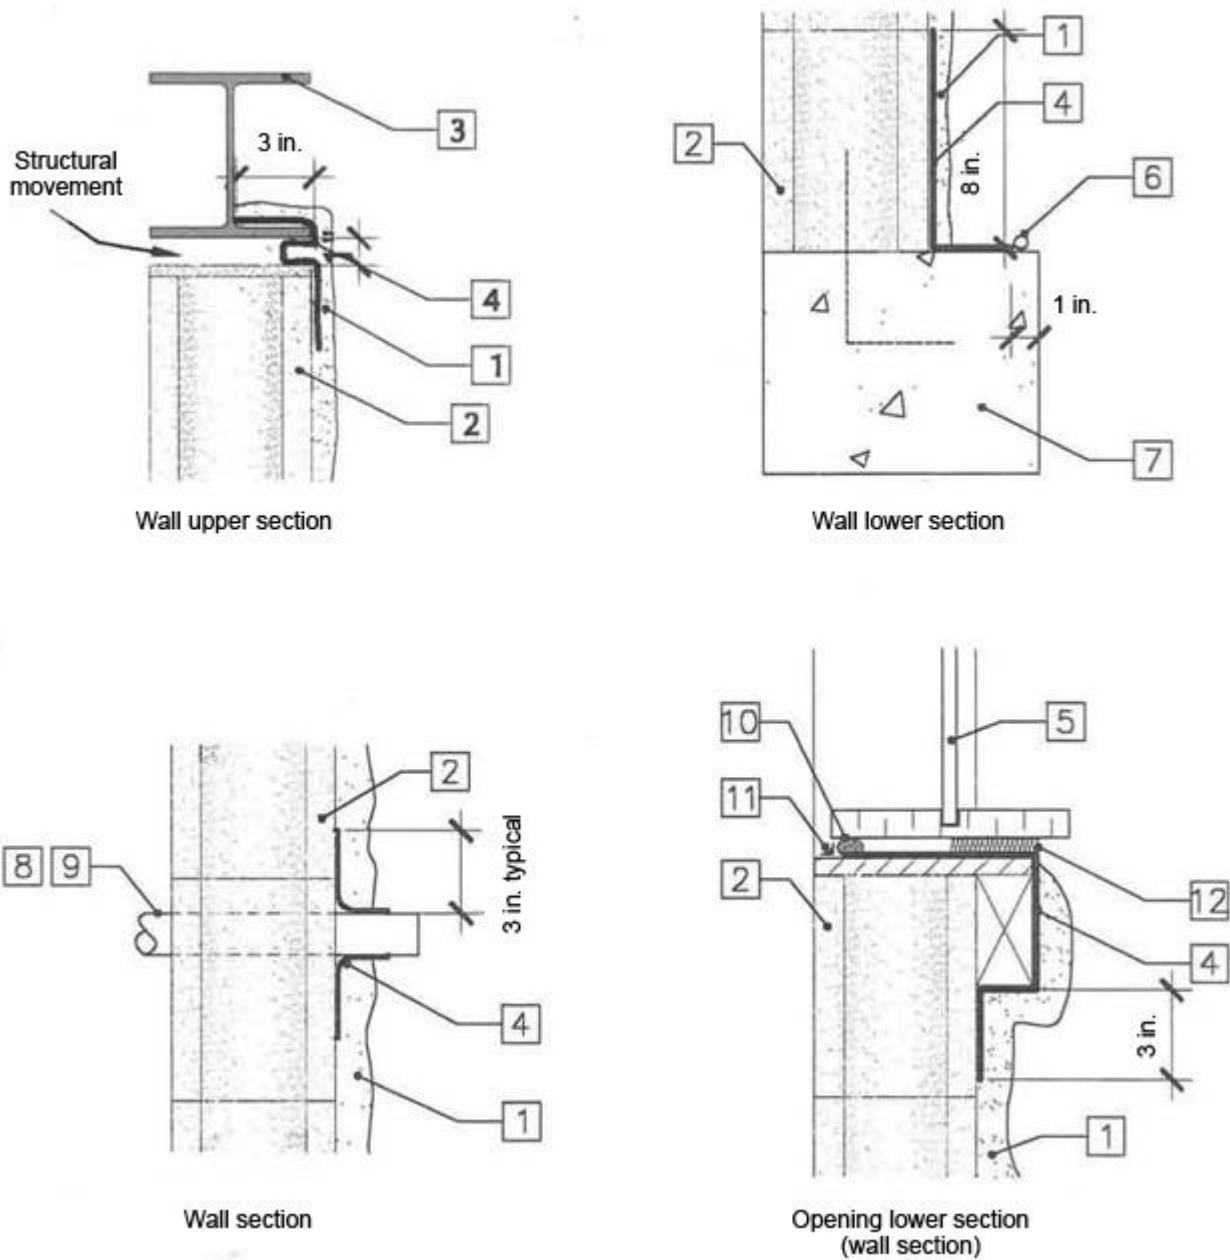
Details of transition membrane at joints between masonry wall and steel frame
